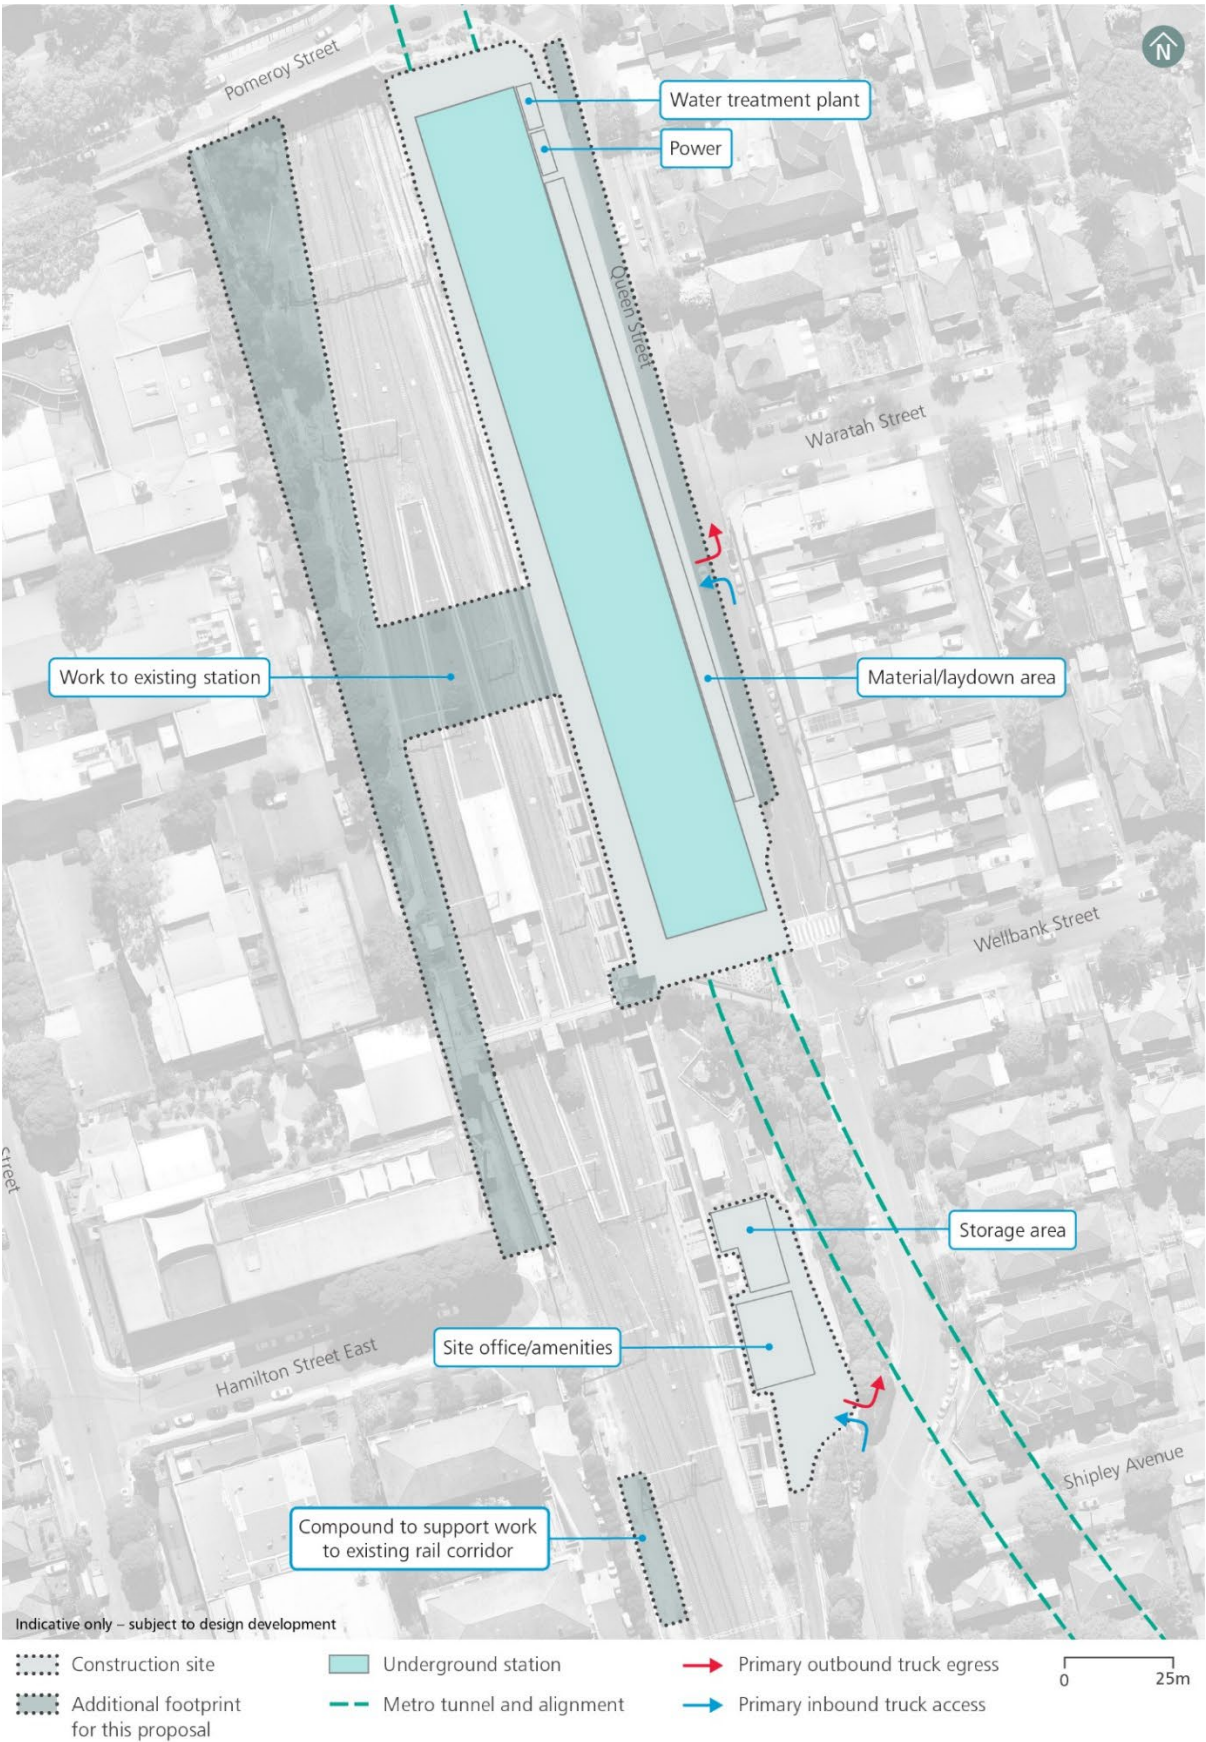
Indicative construction sites layout – North Strathfield metro station
